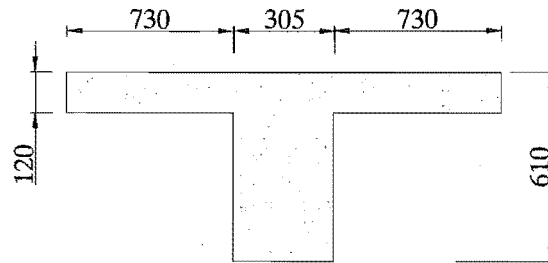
Overall Cross Sectional Dimensions of Transverse Beams at Sixth Floor
